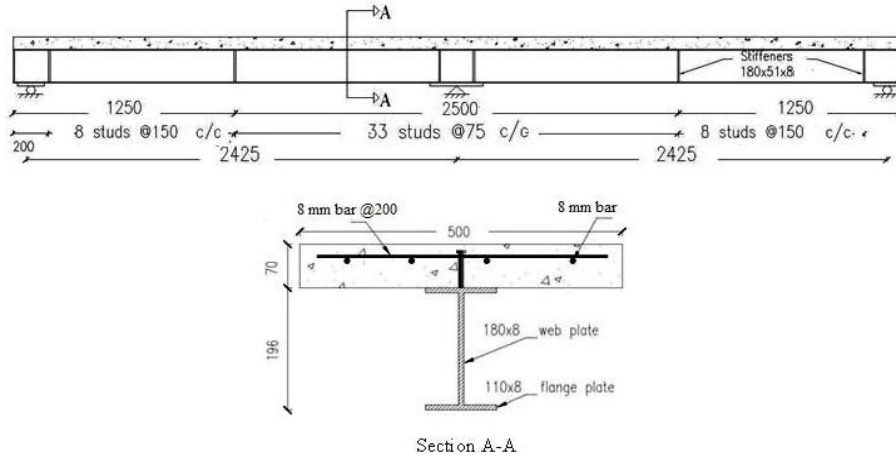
Geometry of control girder and distribution of shear studs (dimensions in mm)
